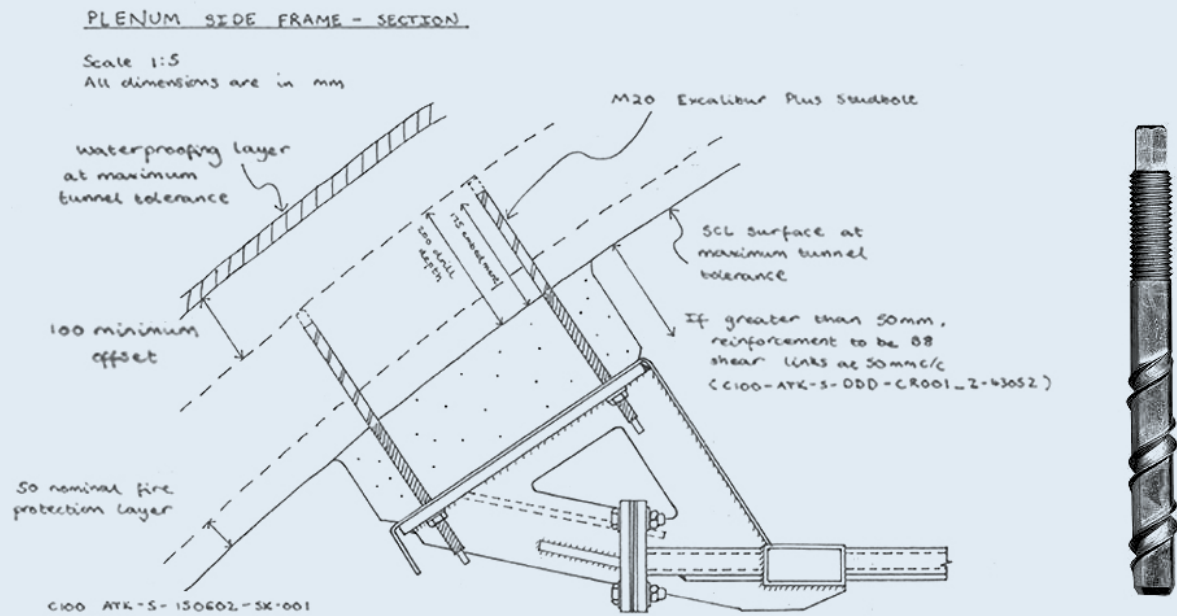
Design Development Sketch – Showing Grout Infill and Stud Anchors and Self-Tapping Threaded M20 Stud-Anchor
